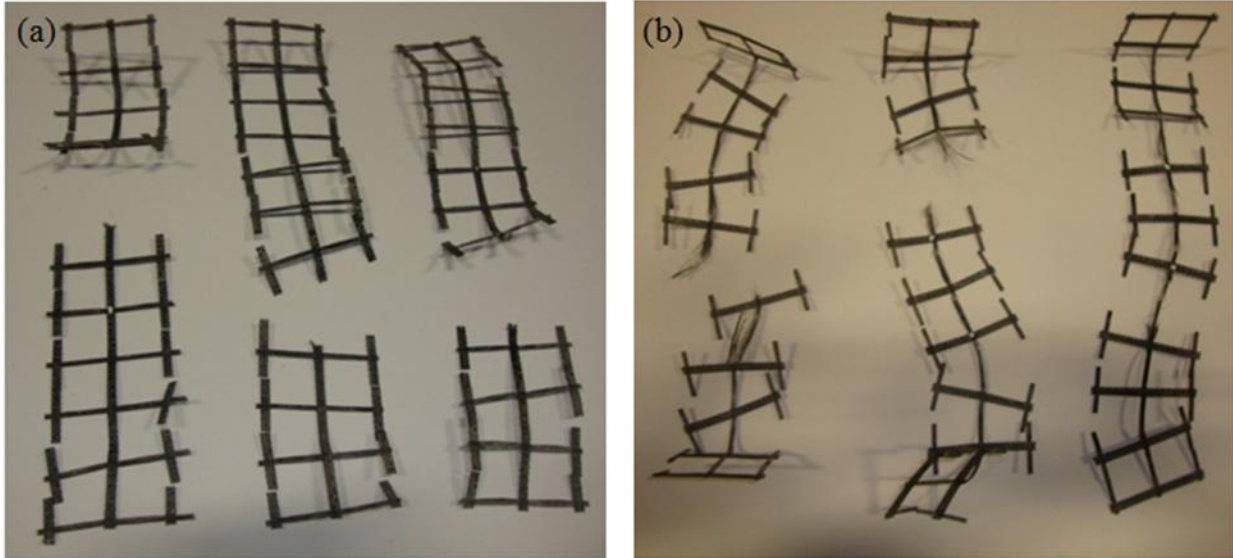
Damaged KGG1 geogrid rib strength test specimens after the test: (a) machine direction, (b) cross-machine direction
